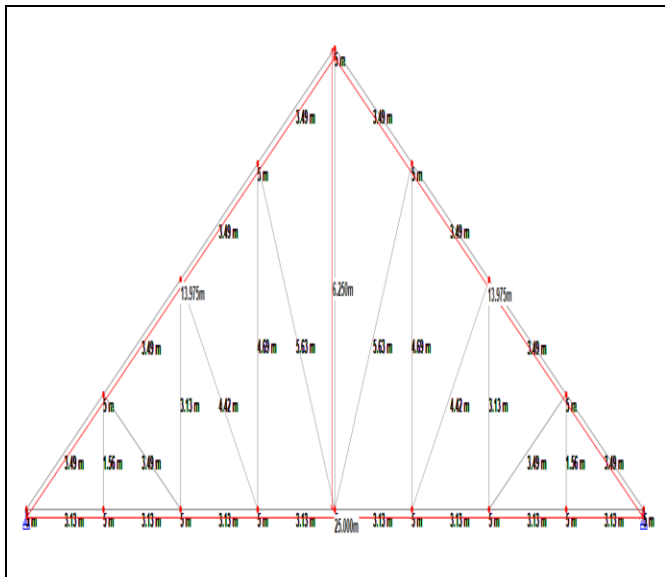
2-D Model of Steel Truss by using Angle Section.
